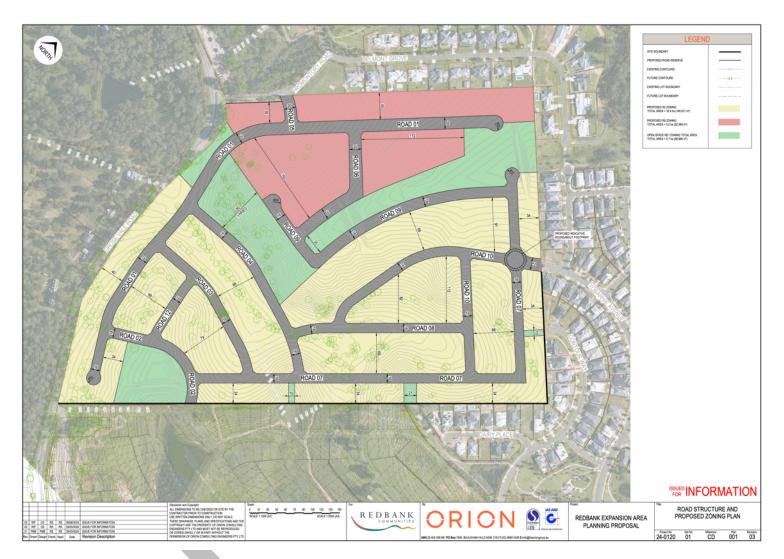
Redbank 'Kemsley Park' Structure Plan
